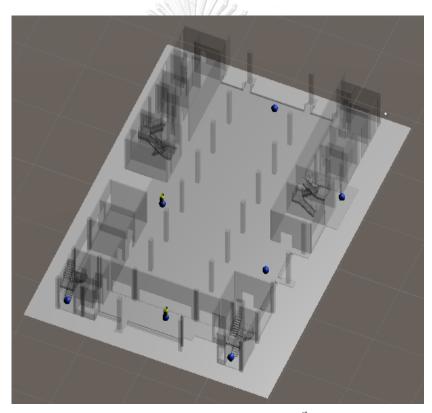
Fire extinguisher installation plan for 1st floor of scenario 2D
